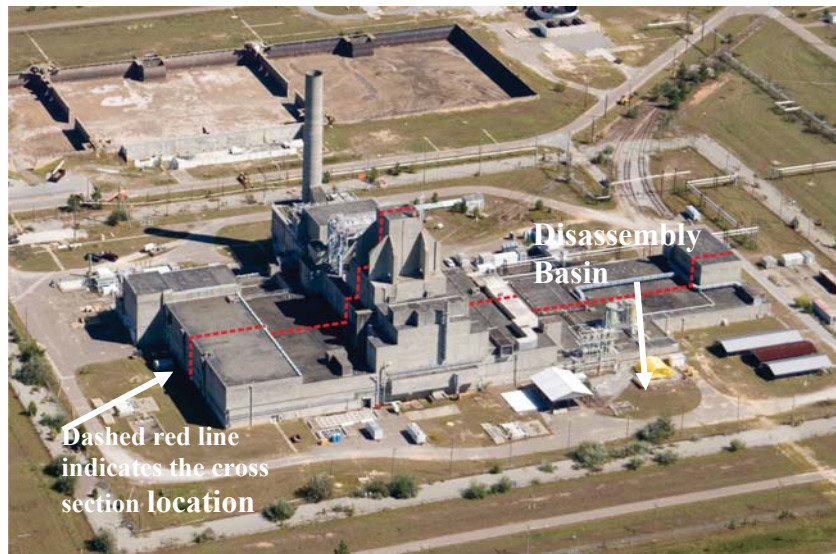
Photo of the 105-P reactor building (similar to the 105-R building).
